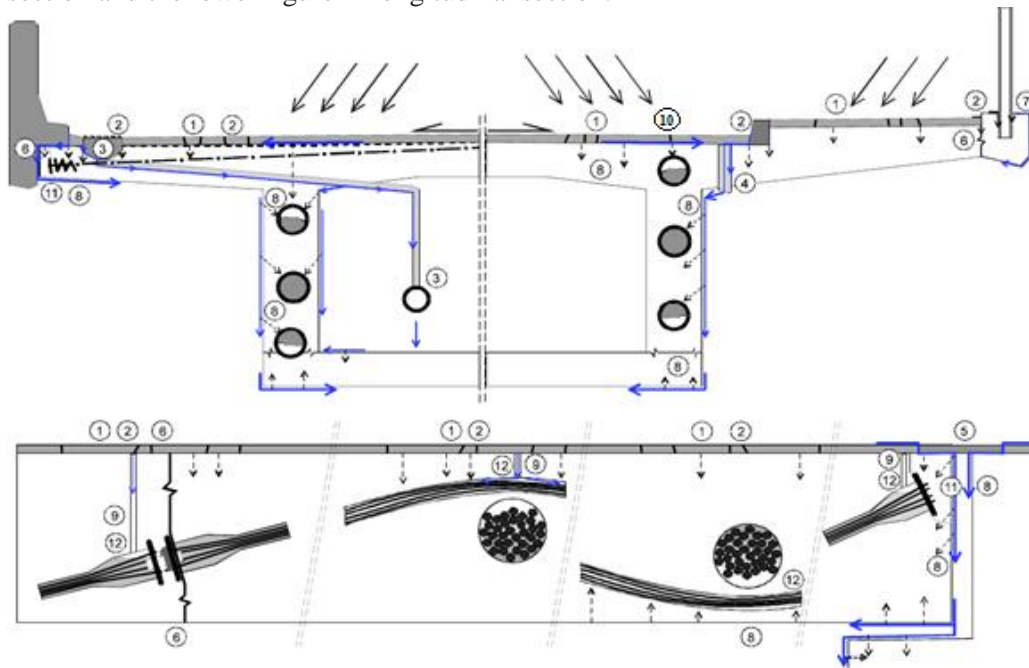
Hazard scenarios for post-tension steel in a typical box girder bridge. Indication of potentially weak points where water (possible with chlorides) can gain access to the tendons and cause corrosion (Matt, 2000).
